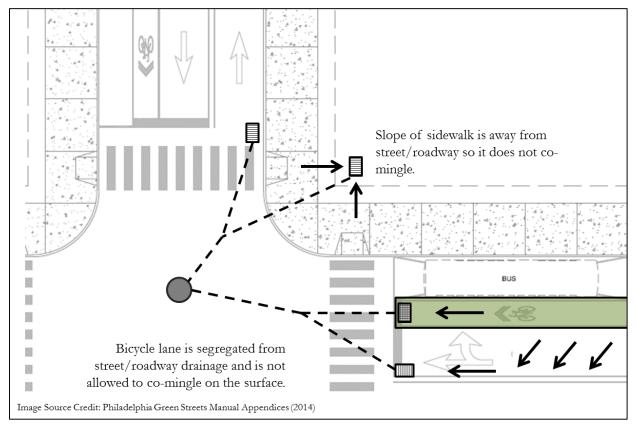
Schematic showing hydraulic disconnection of sidewalks and bicycle lanes in a typical intersection.
